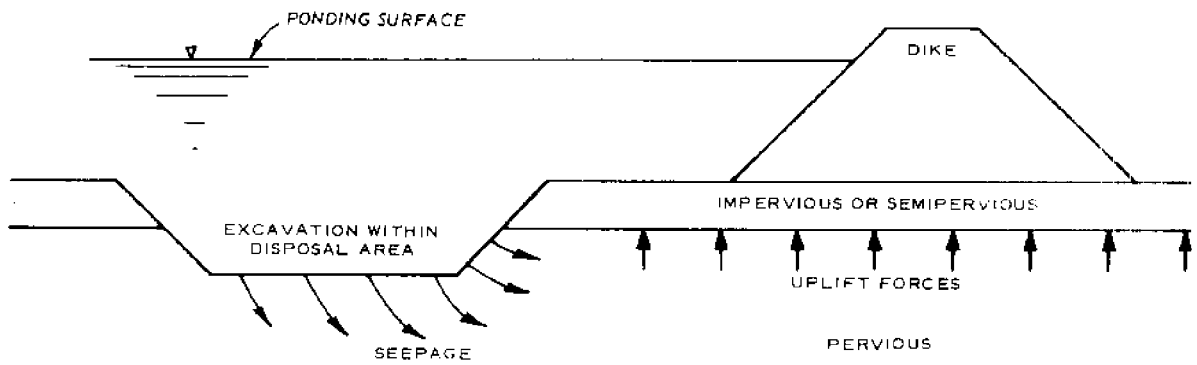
Seepage Entrance Through Area Excavated Within Disposal Area
